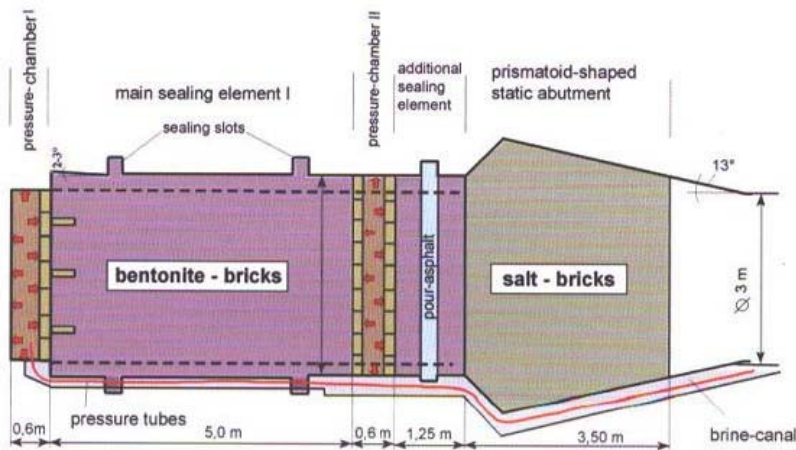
Tunnel Plugging Test in salt /Sitz et al. 2002/.
